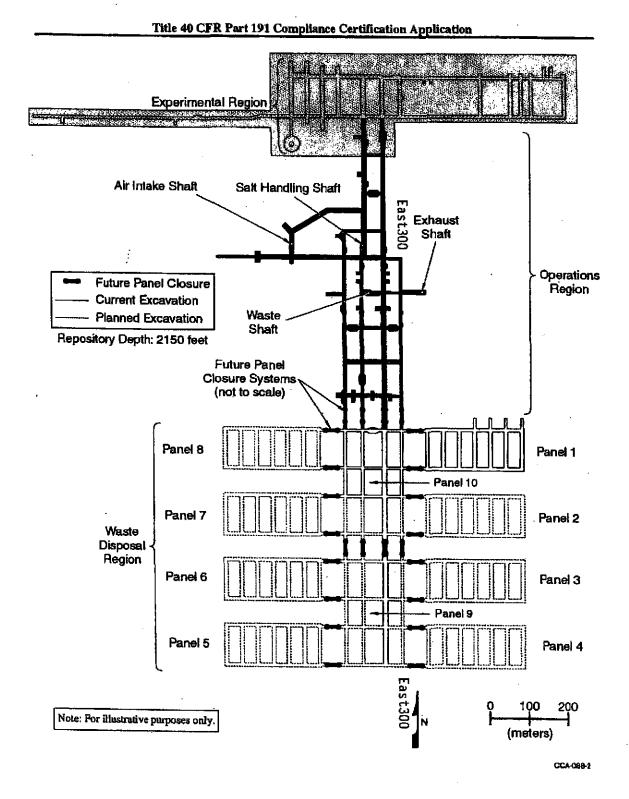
Plan View of WIPP Underground Facility and Panel Closure Systems
